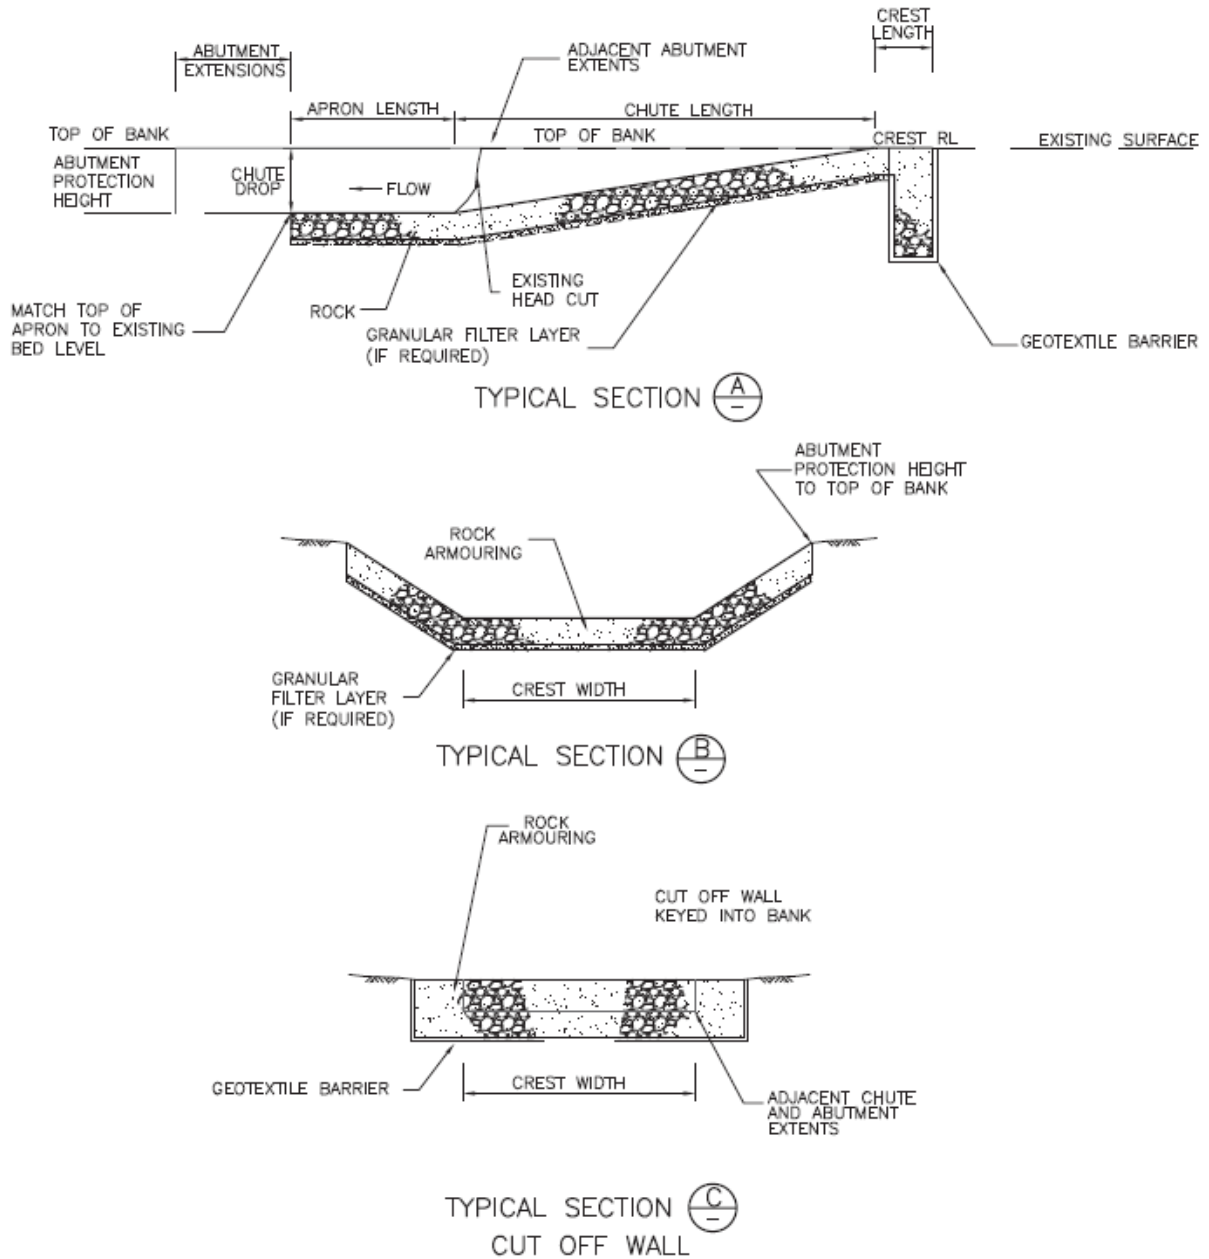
Pillar Zone Bank Protection - Typical Layout and Cross Section
